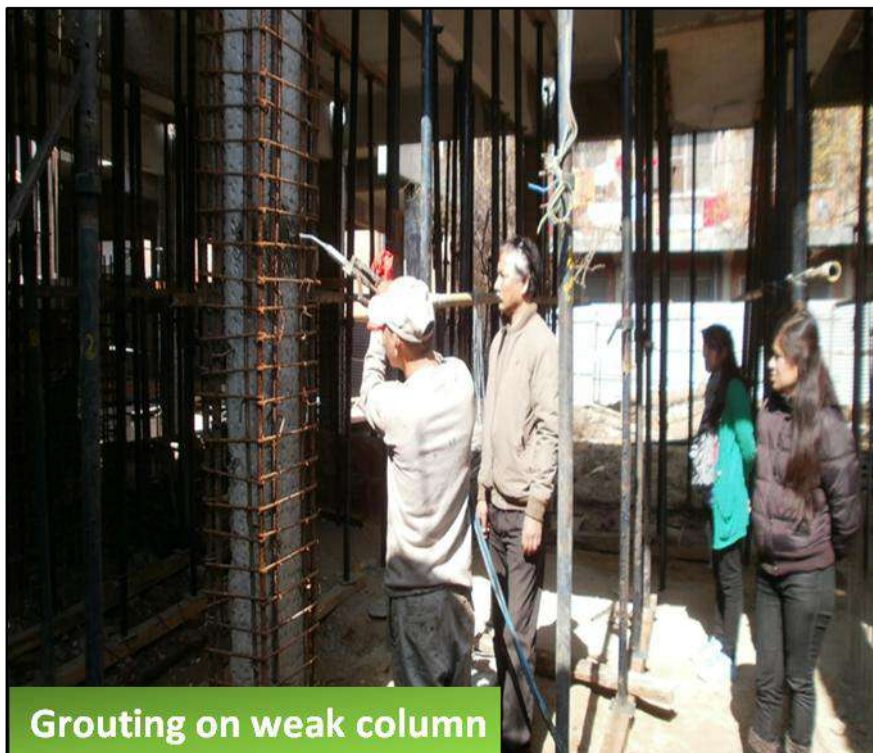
Grouting on weak column (Source: MRB & Associates)
